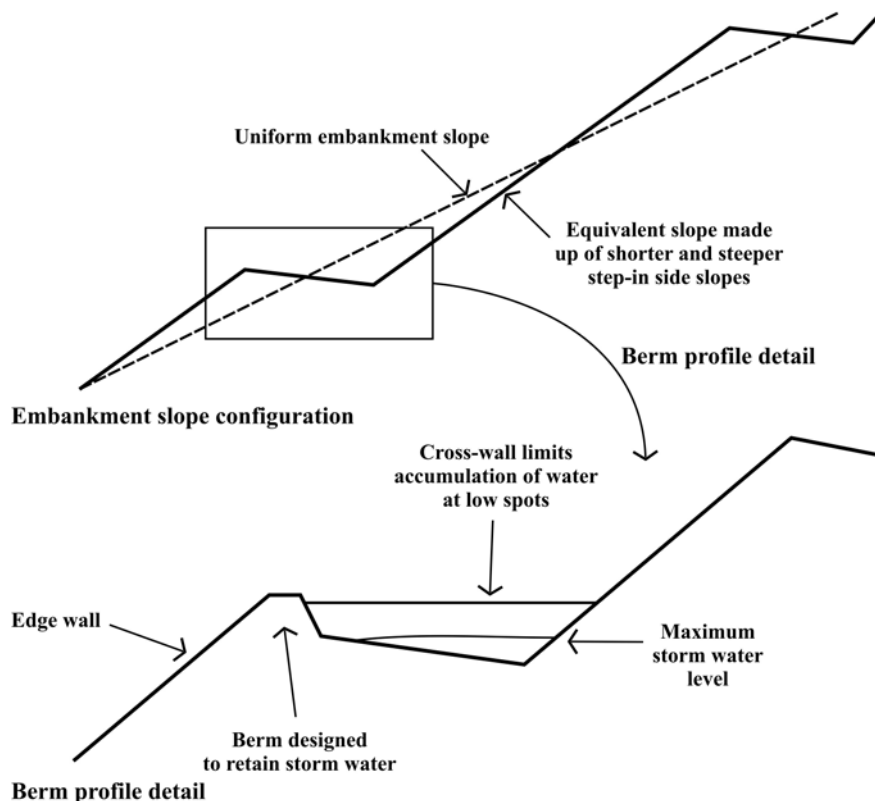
Tailings impoundment embankment side slope and berm details (CM, 1996).
